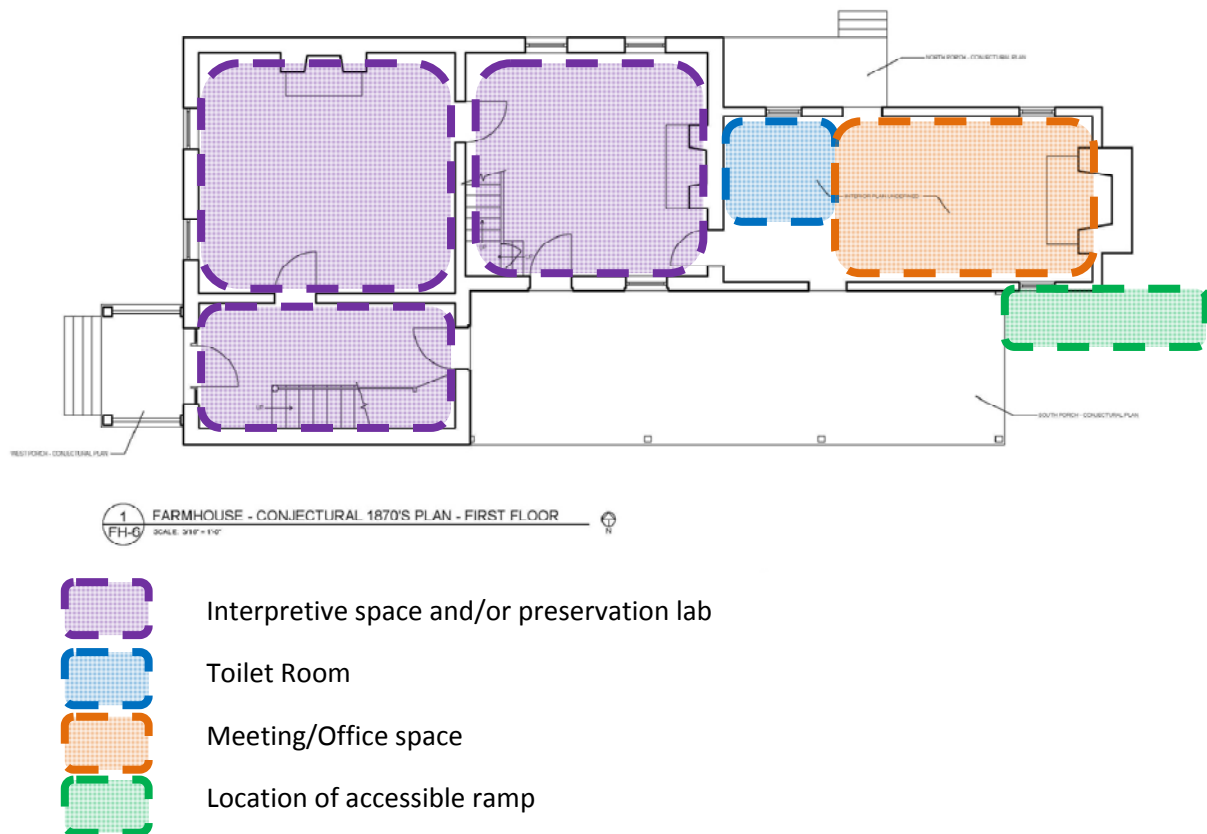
Space utilization plan for the first floor. Note the re-introduction of the front porch, side porch, and back porch as well as the Pirkey rear frame addition.
